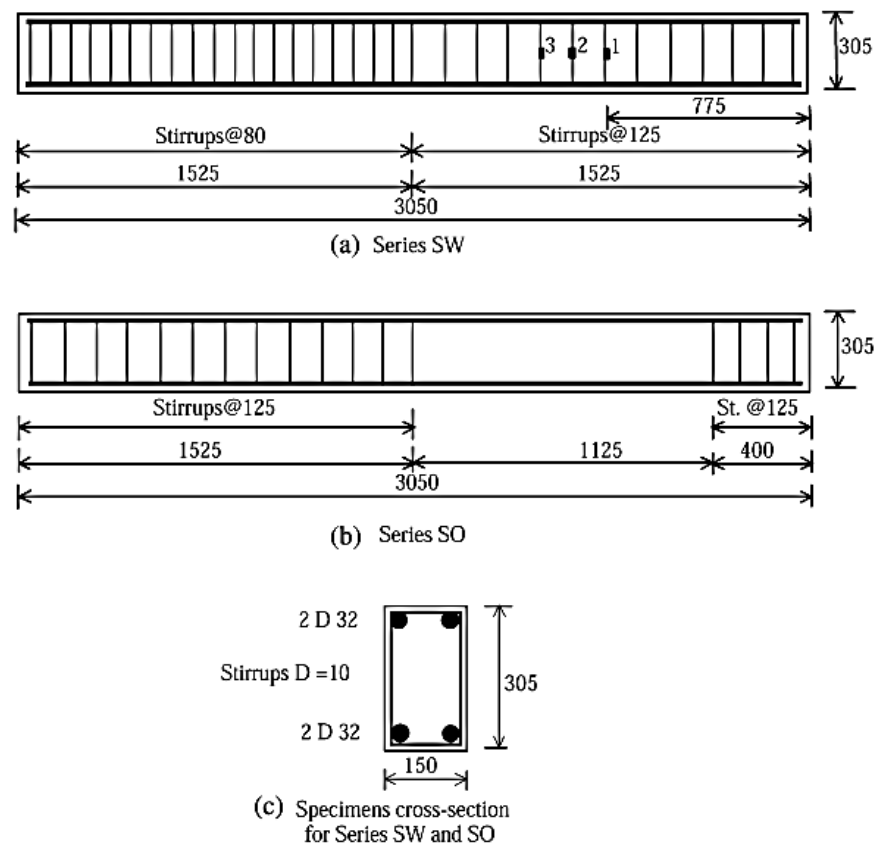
Configuration and reinforcement for beam specimens (Khalifa and Nanni, 2002).
